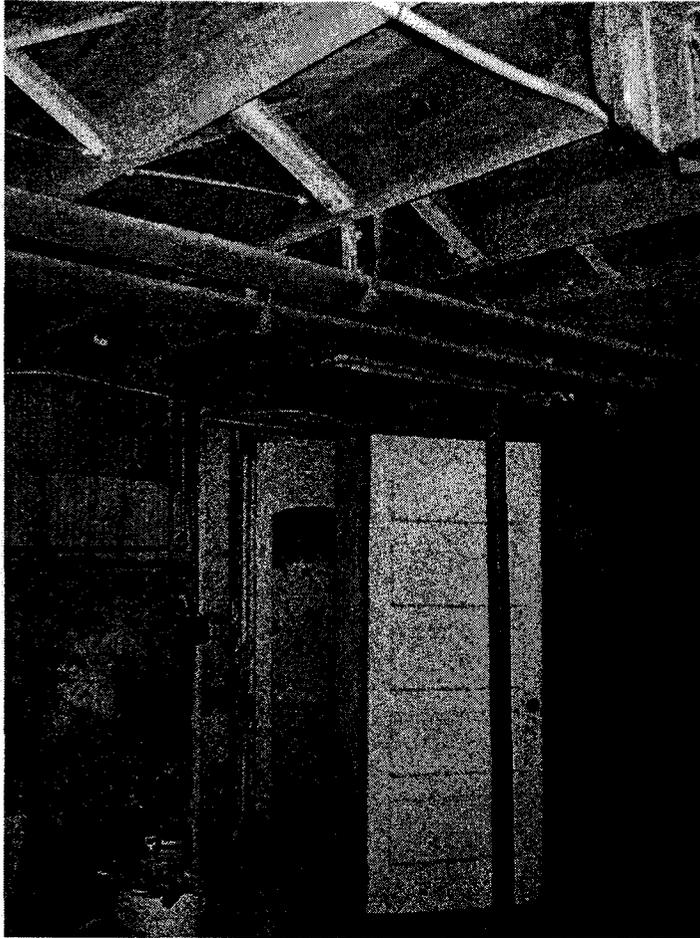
Basement view showing concrete foundation, terra cotta blocks and first floor joists.
